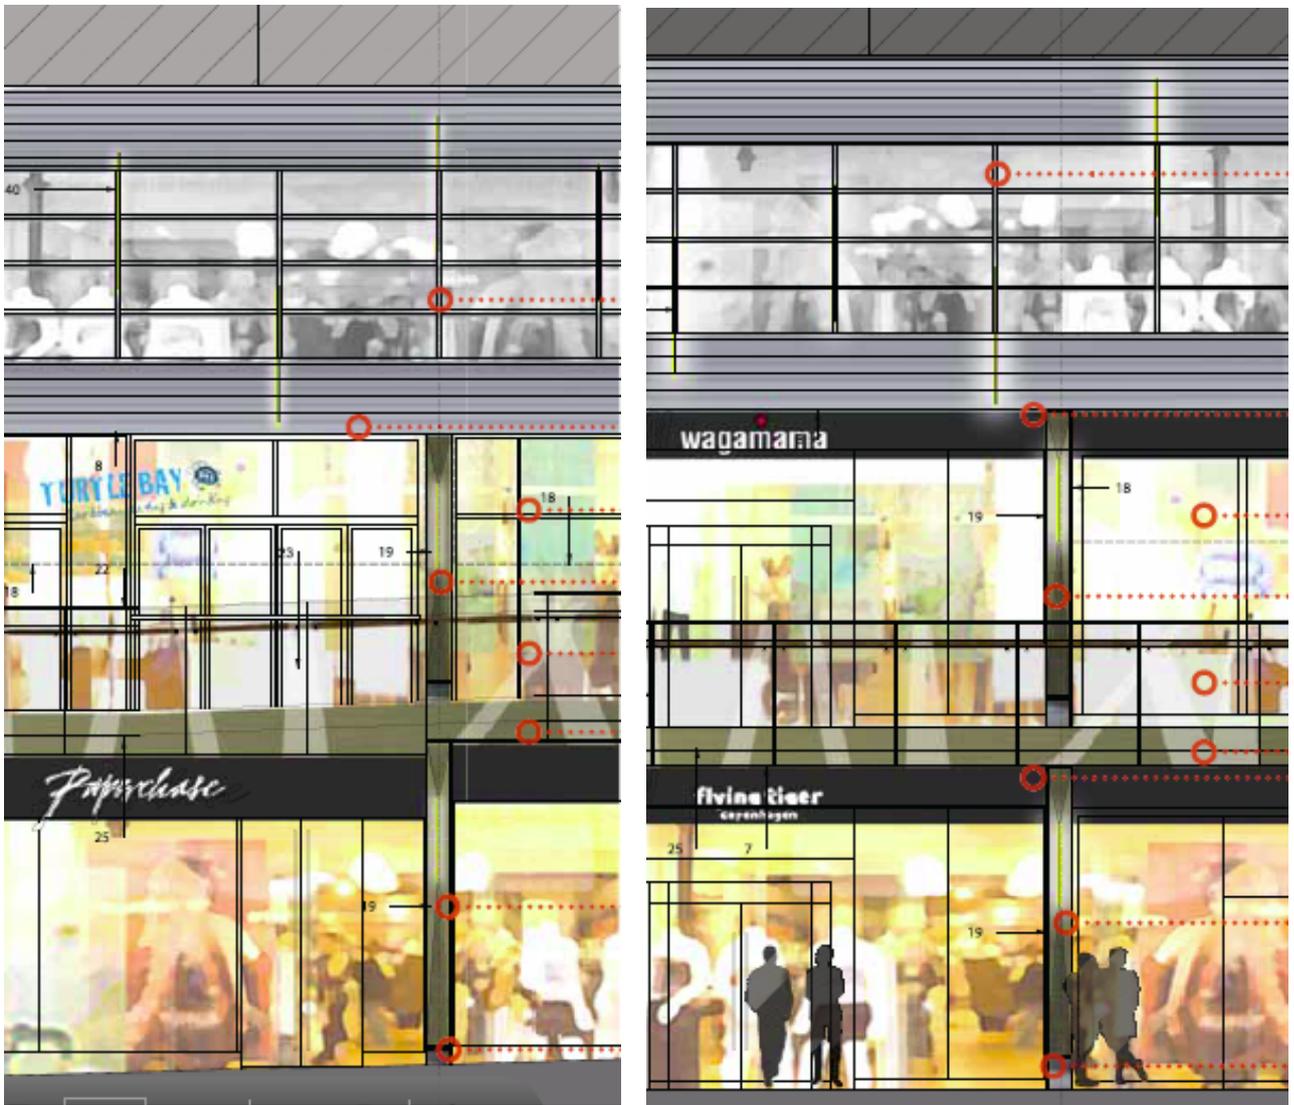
Typical South (left) and North (right) shopfront elevations
